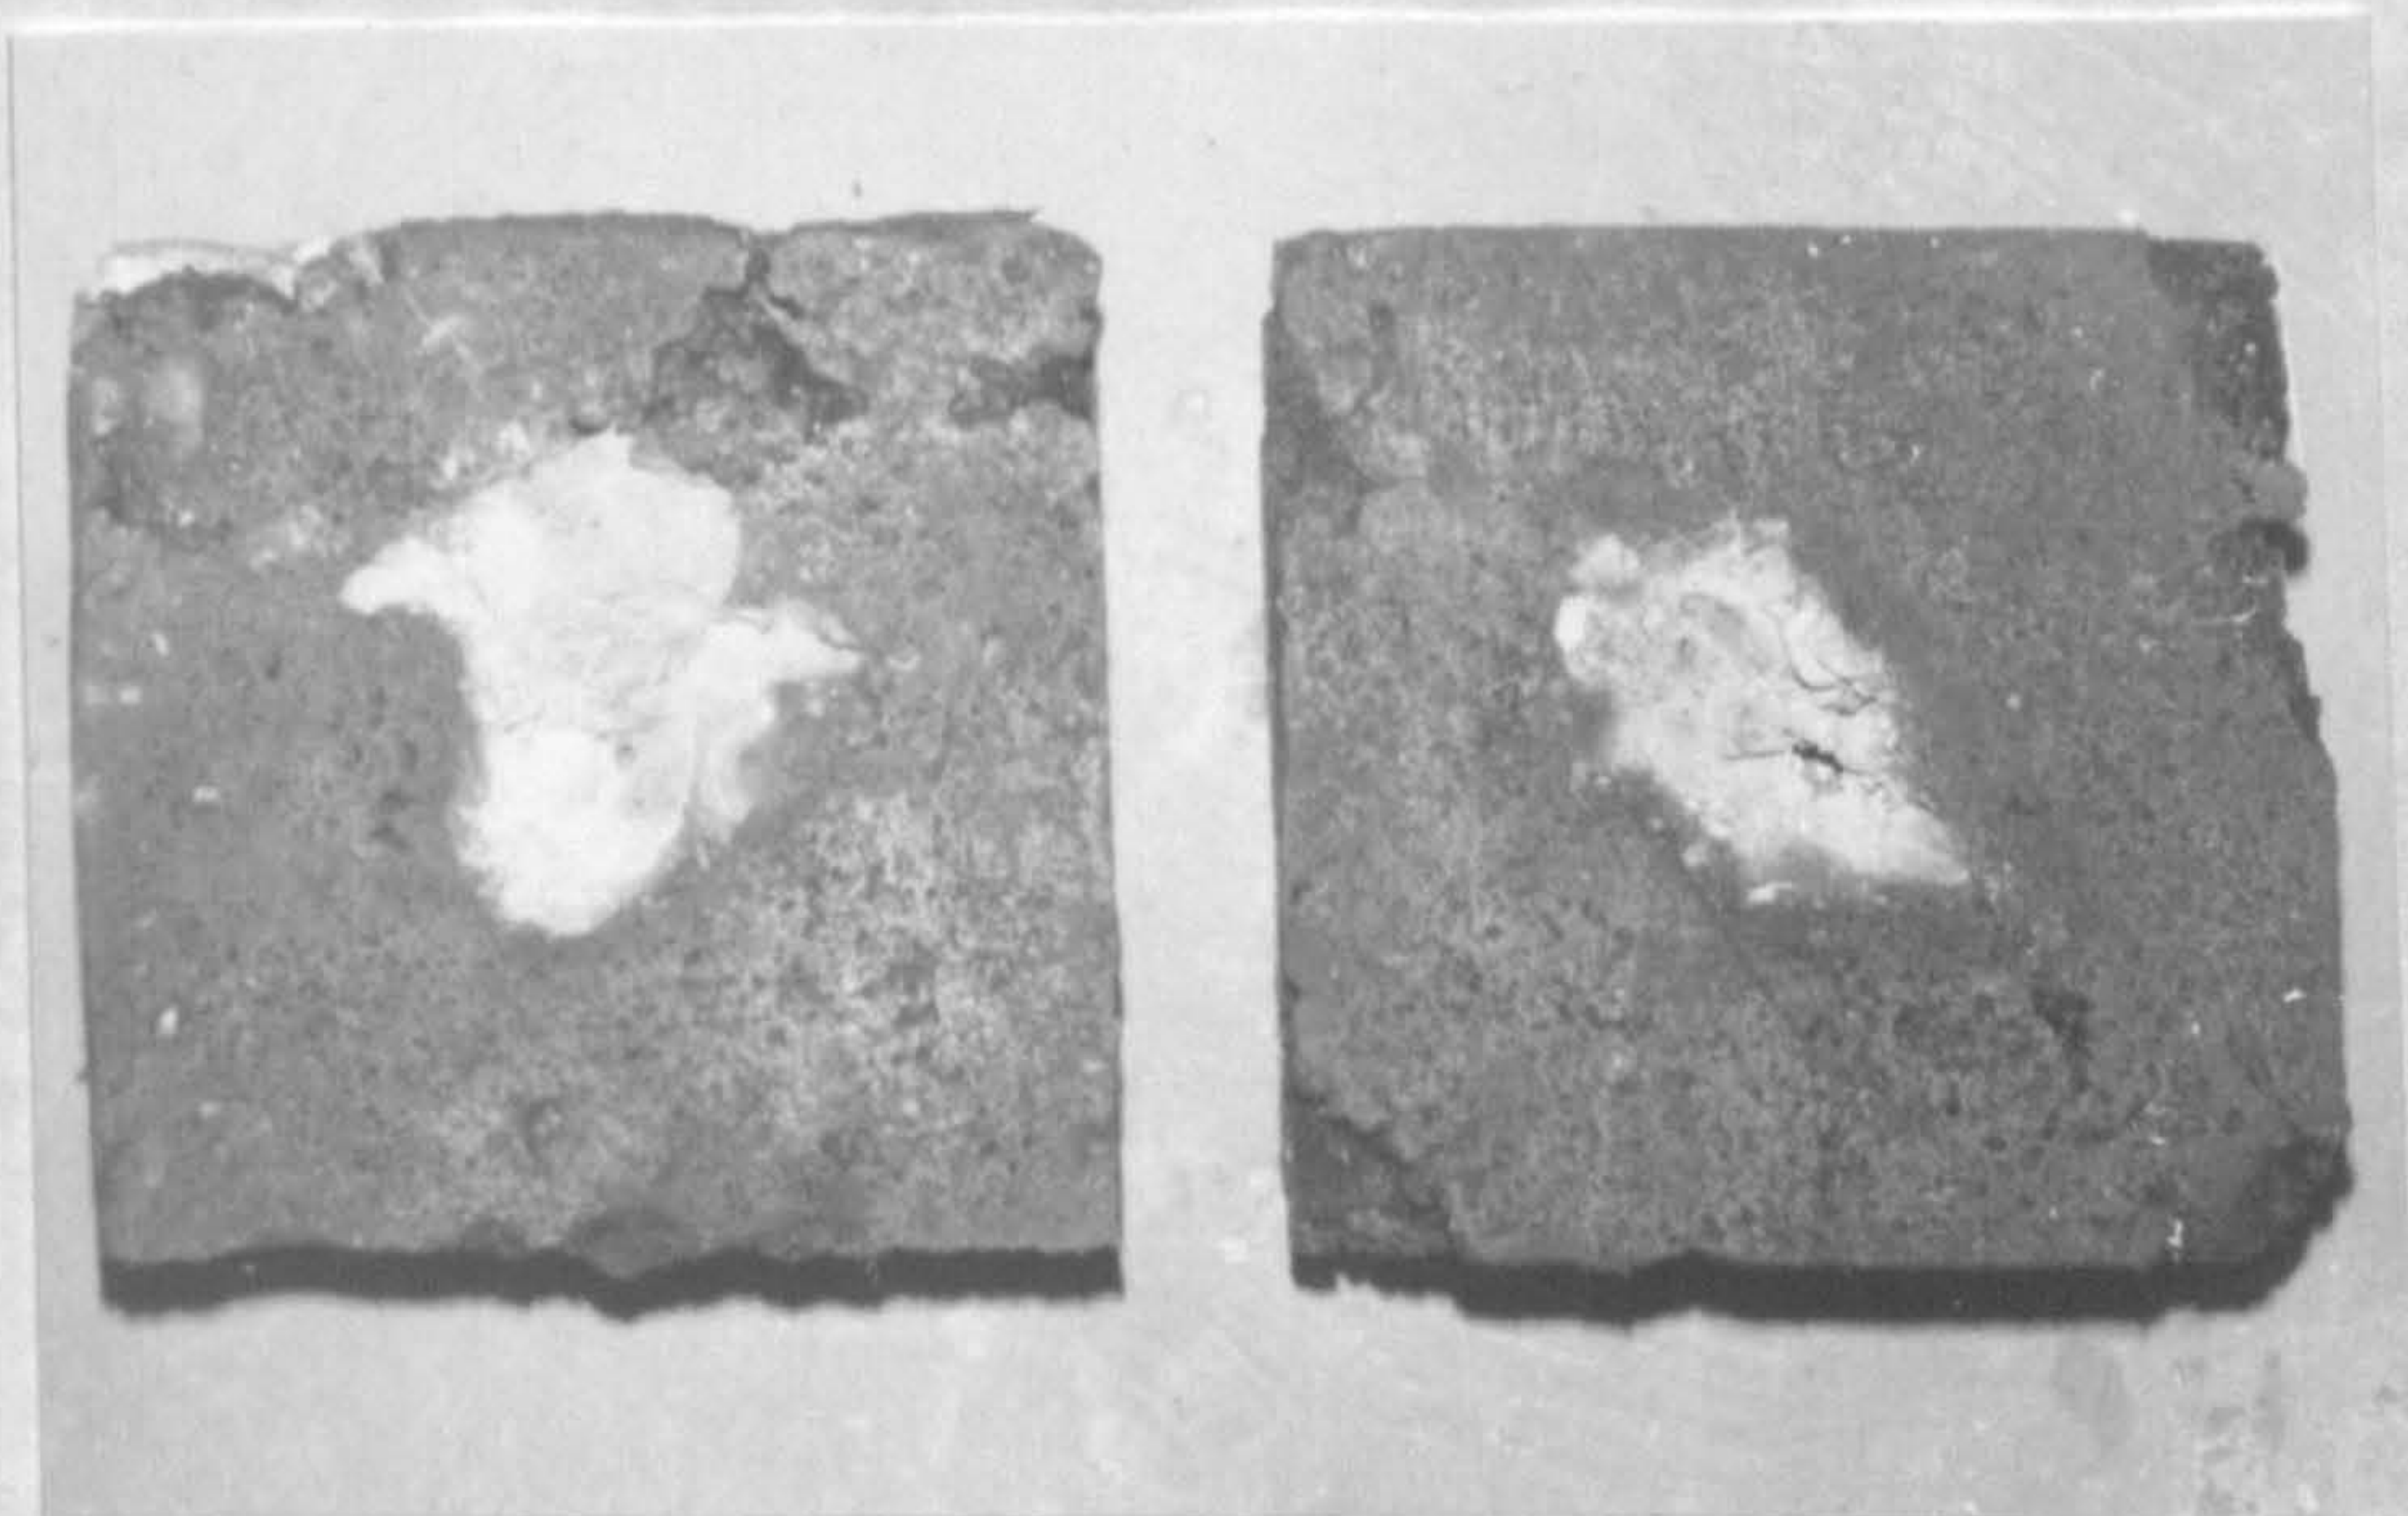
TYPICAL IMPACT FACE DAMAGE, SERIES 12 (BALL)
